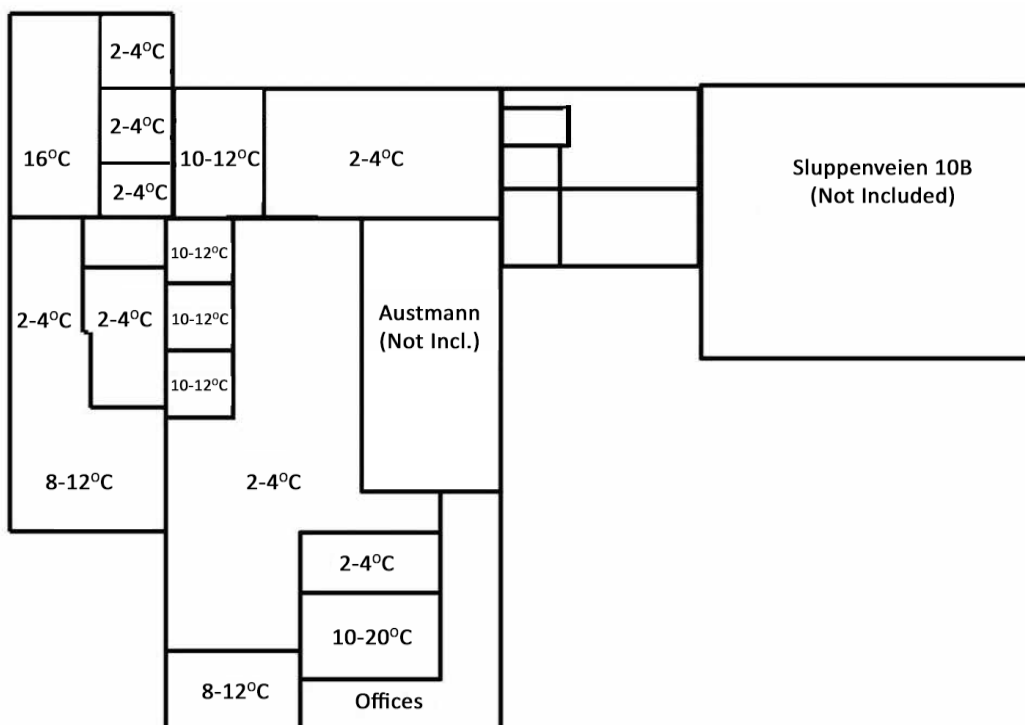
SLV10: Floor plan with storage room set-point air temperatures.
